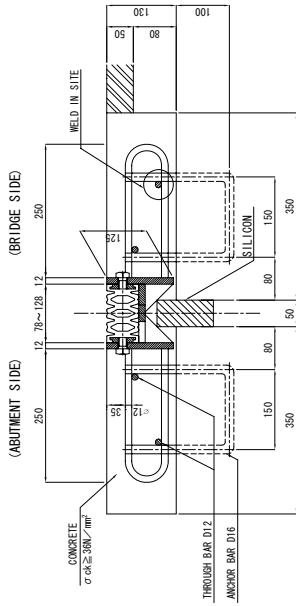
DETAILS OF EXPANSION JOINT AND DRAINAGE (FANYE BRIDGE)
